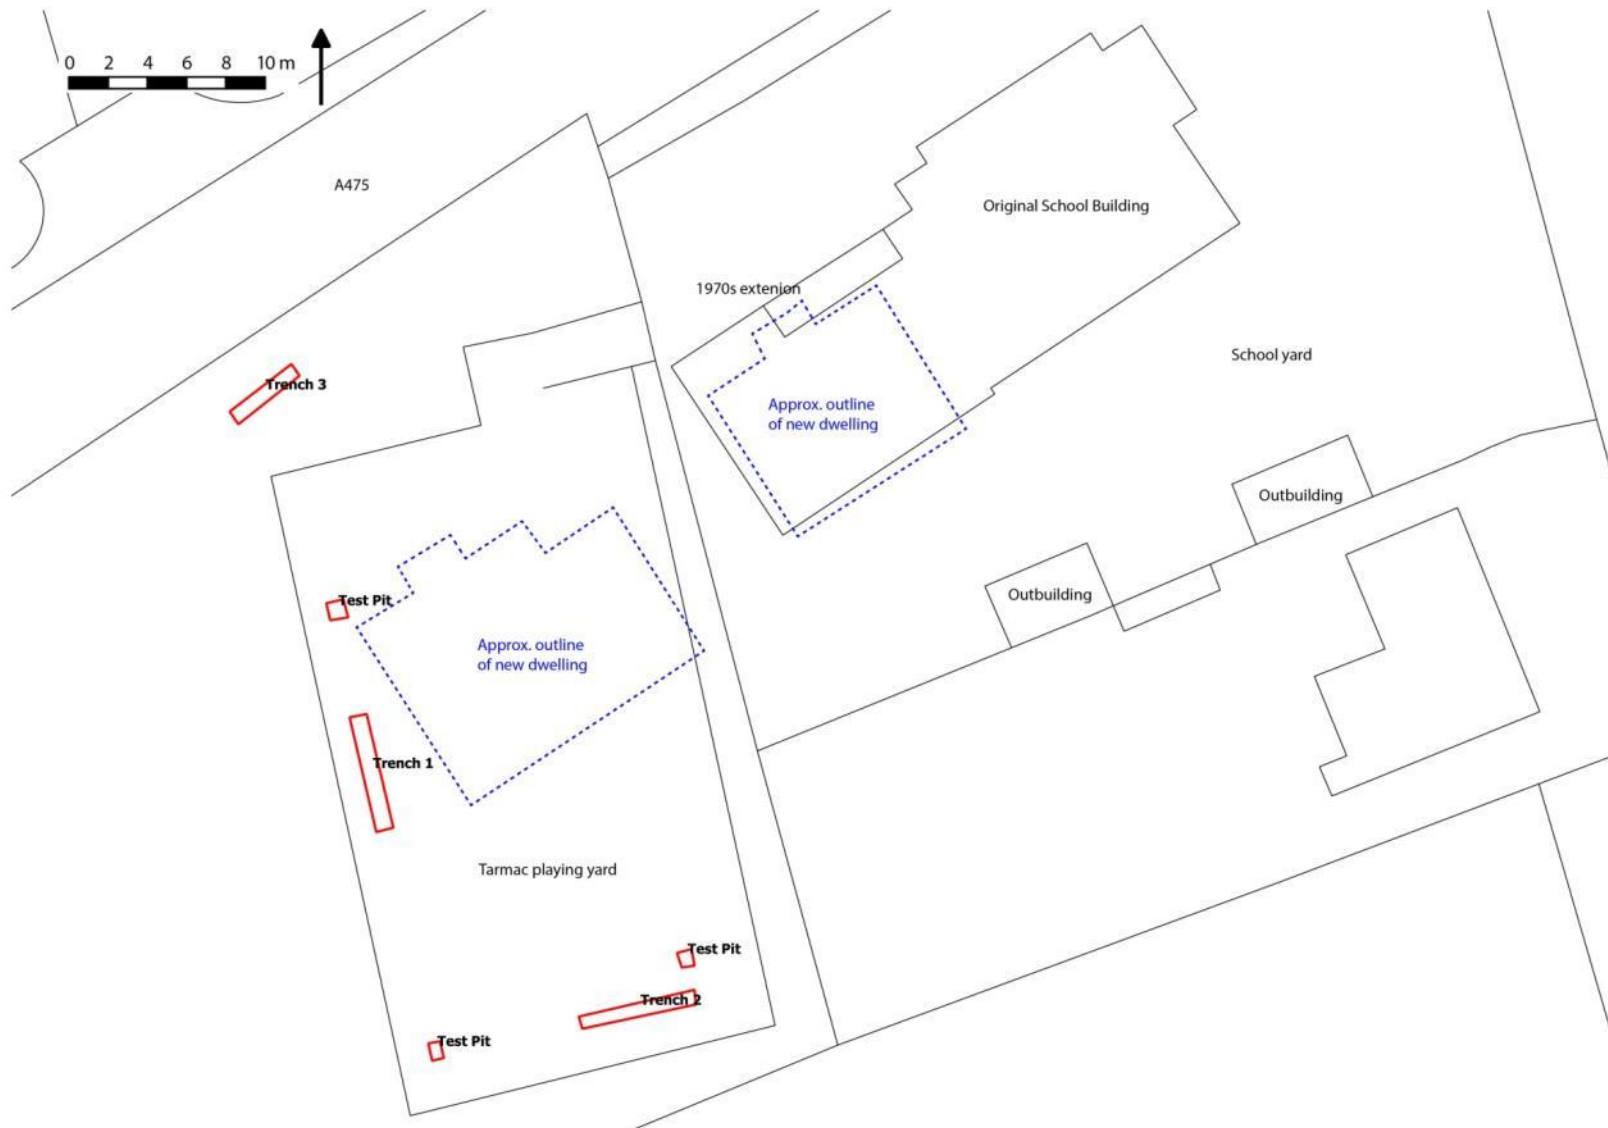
Site location plan showing the location of the excavated trenches, and outlines of new dwellings
